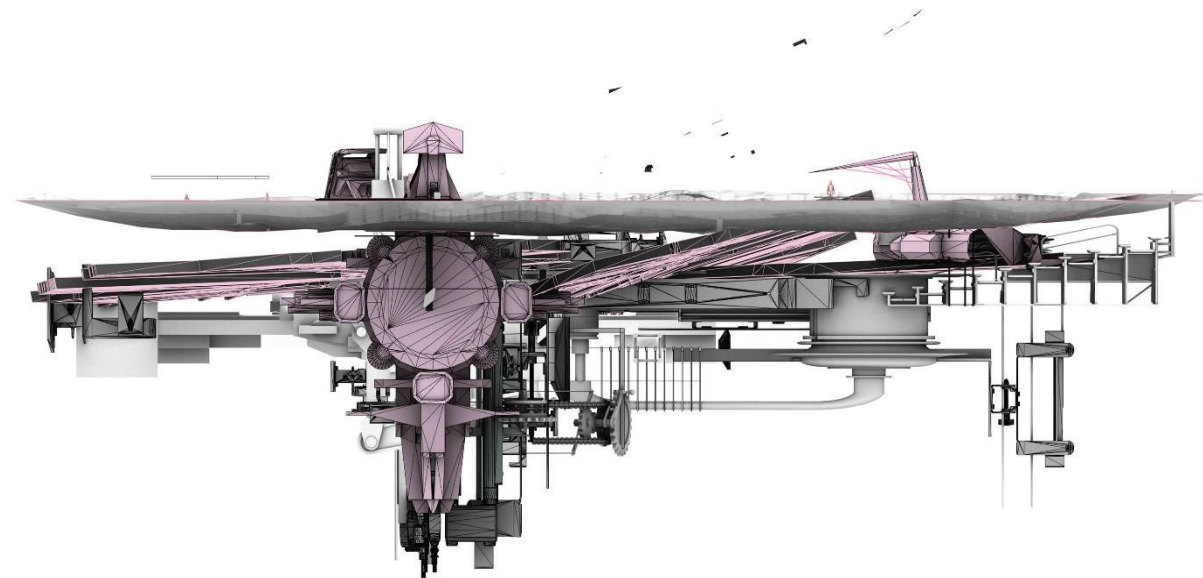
Elevation of site construct, Karina Deschamps. 2021
